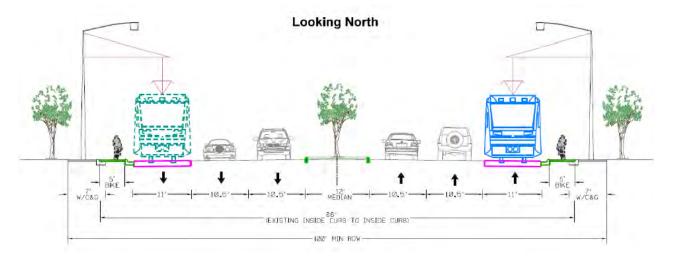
Elevation View of Side-running LRT along Maryland Parkway with Bike Lane
